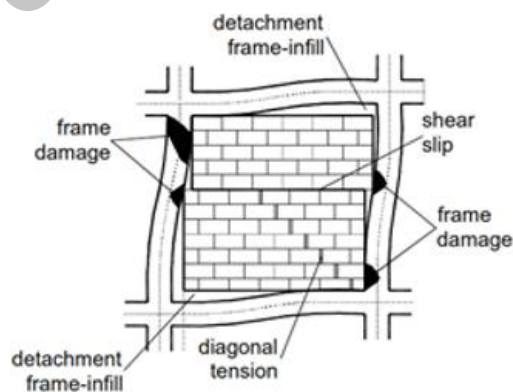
The sliding shear (SS) mode, the diagonal cracking (DK) mode, The Frame Failure (FF) mode
